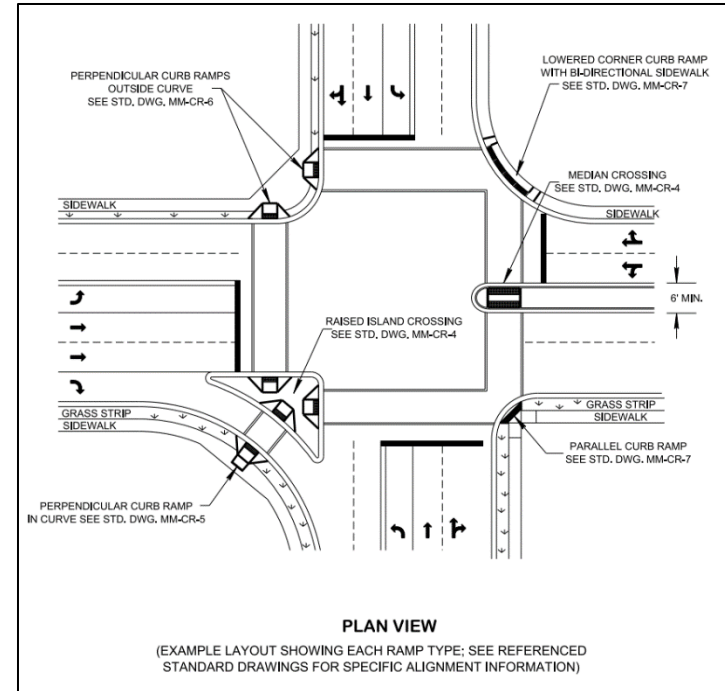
TDOT Standard Drawing MM-CR-1: Detectable Warning Surface Placement on Curb Ramps
